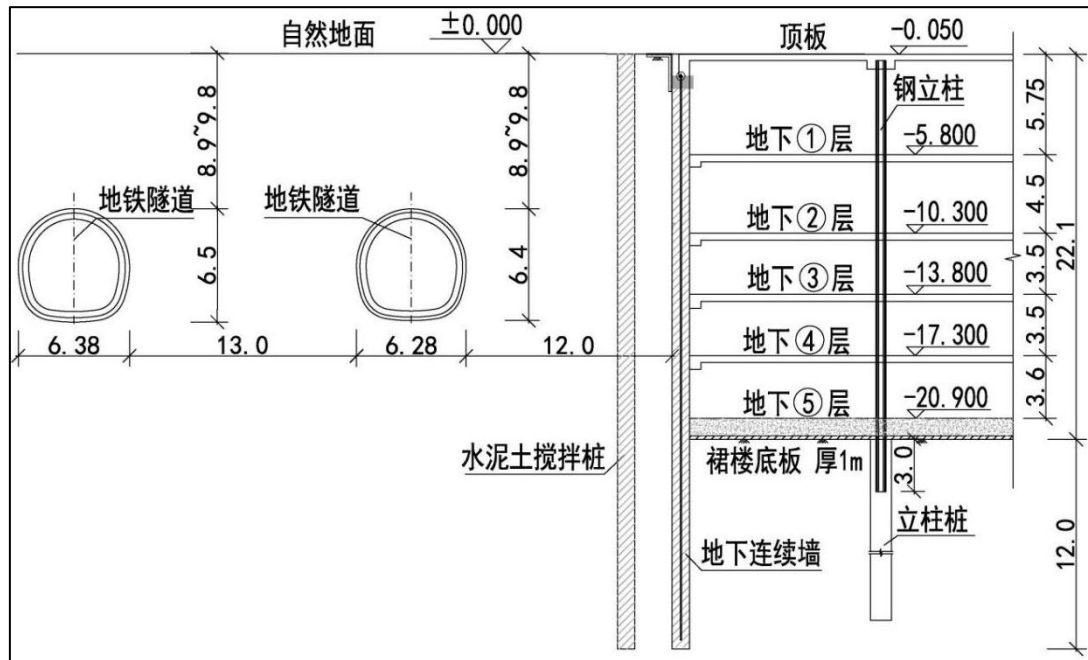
Support Structure Design Profile Adjacent to the Metro Side (units: meters)
